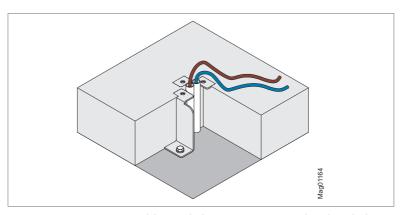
Mounting variant 4: Slabs, interlocking paving stones, etc. have been laid
